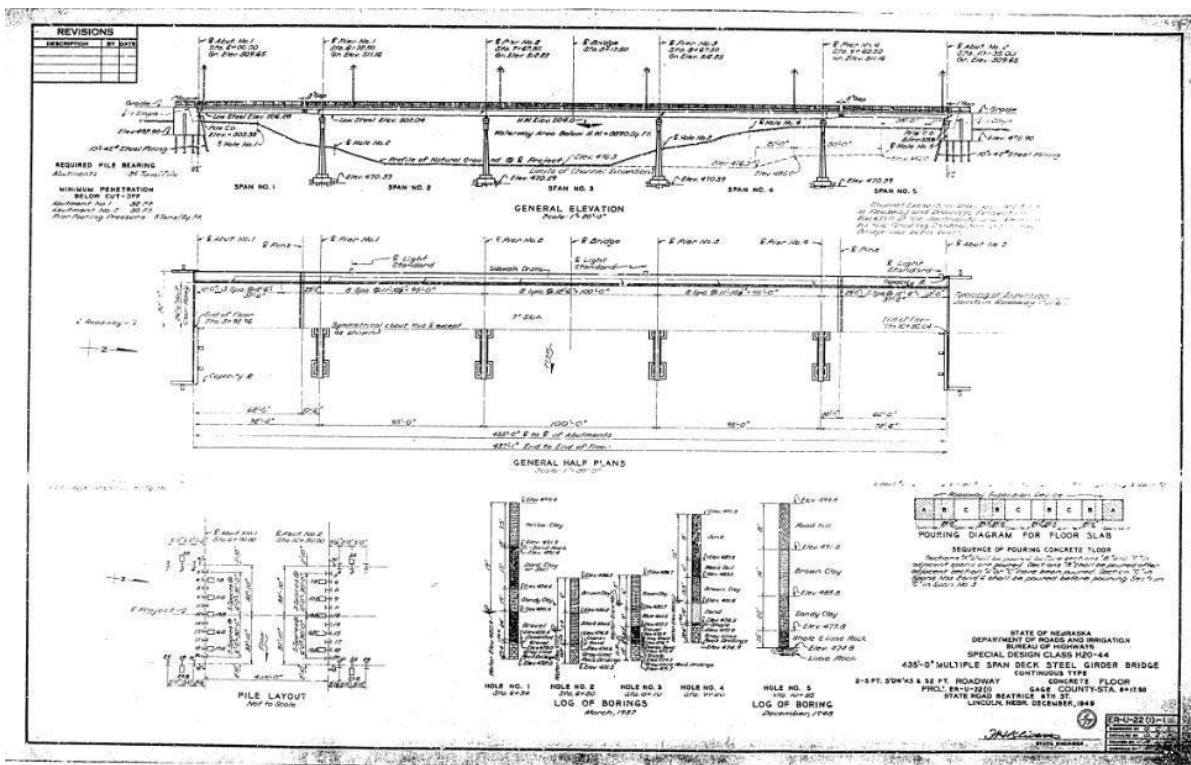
Beatrice Bridge Plan (courtesy of NDOT).
